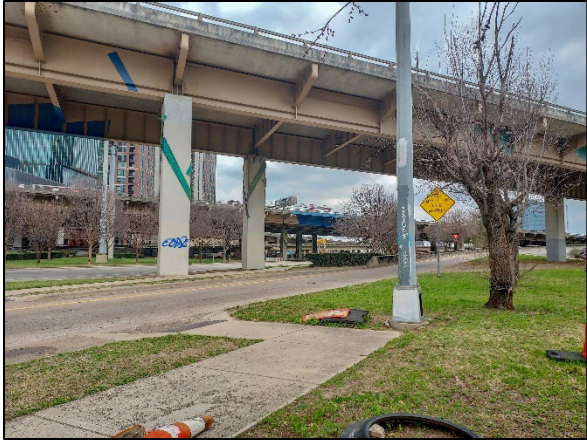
Sidewalk Leads to Highway Ramp w/o Crosswalk
